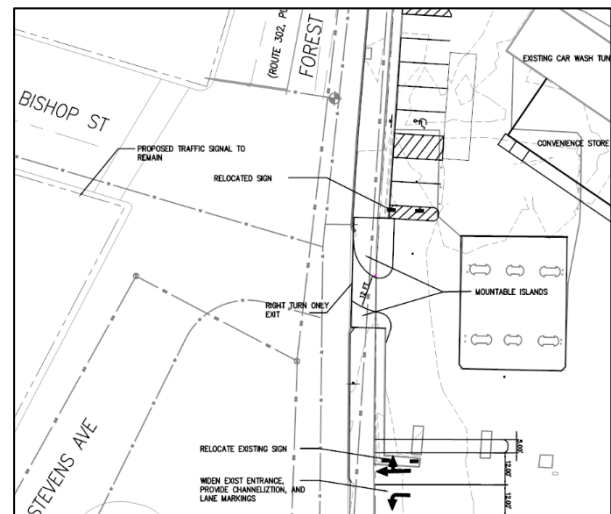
Conceptual Plan Developed by Applicant for Morrill's Corner Redevelopment. Note, middle driveway is reduced to single-lane exit only with mountable curb.
